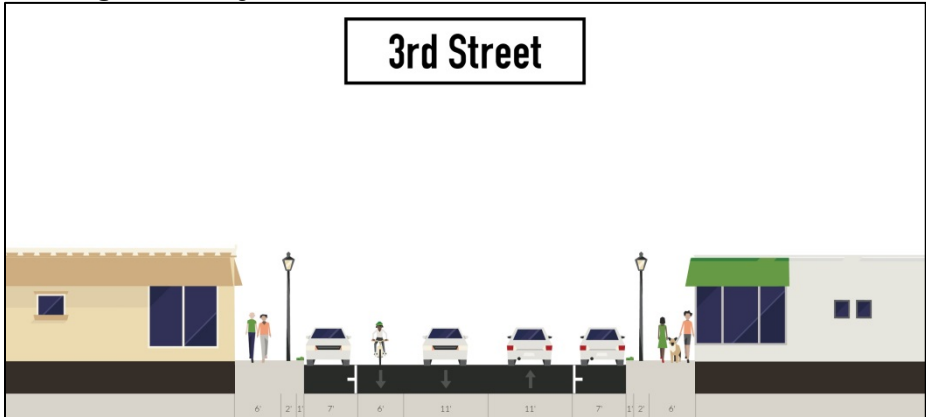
Third Street Cross-section - Alternative 1 Grove Avenue to Birch Avenue (60 Feet Right-of-Way)
